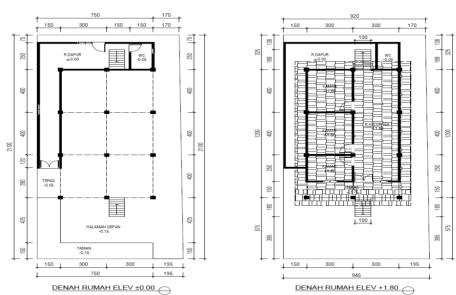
Floor plan drawing of a Stilt house on Mr. Badri's house Source: Authors, 2023
